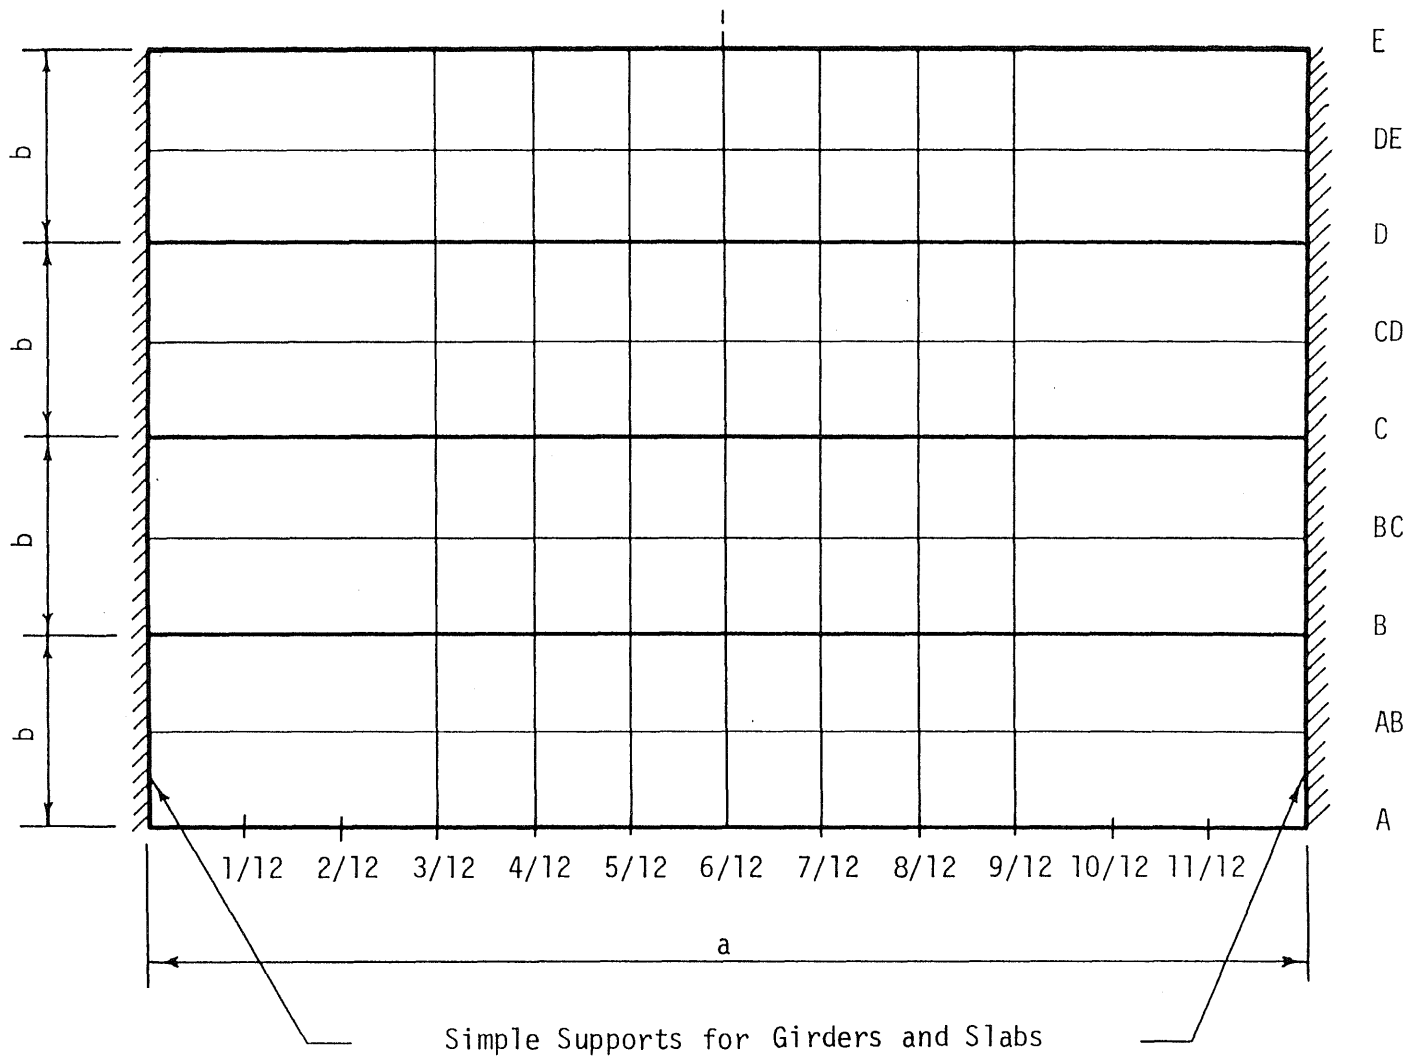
DIAGRAM SHOWING NOTATION FOR SLAB-AND-GIRDER BRIDGES
